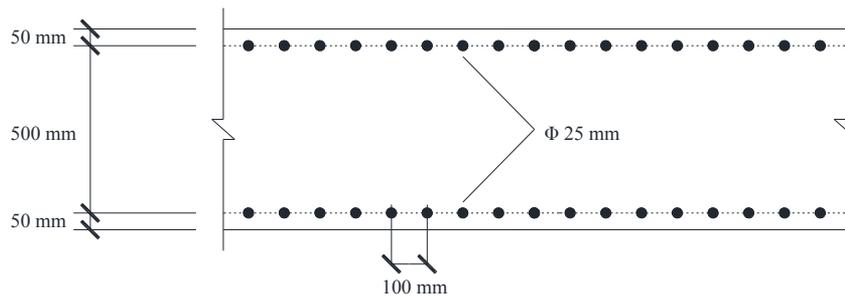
THE REINFORCEMENT LAYOUT IN THE WALL FOR BOTH CONFIGURATIONS
